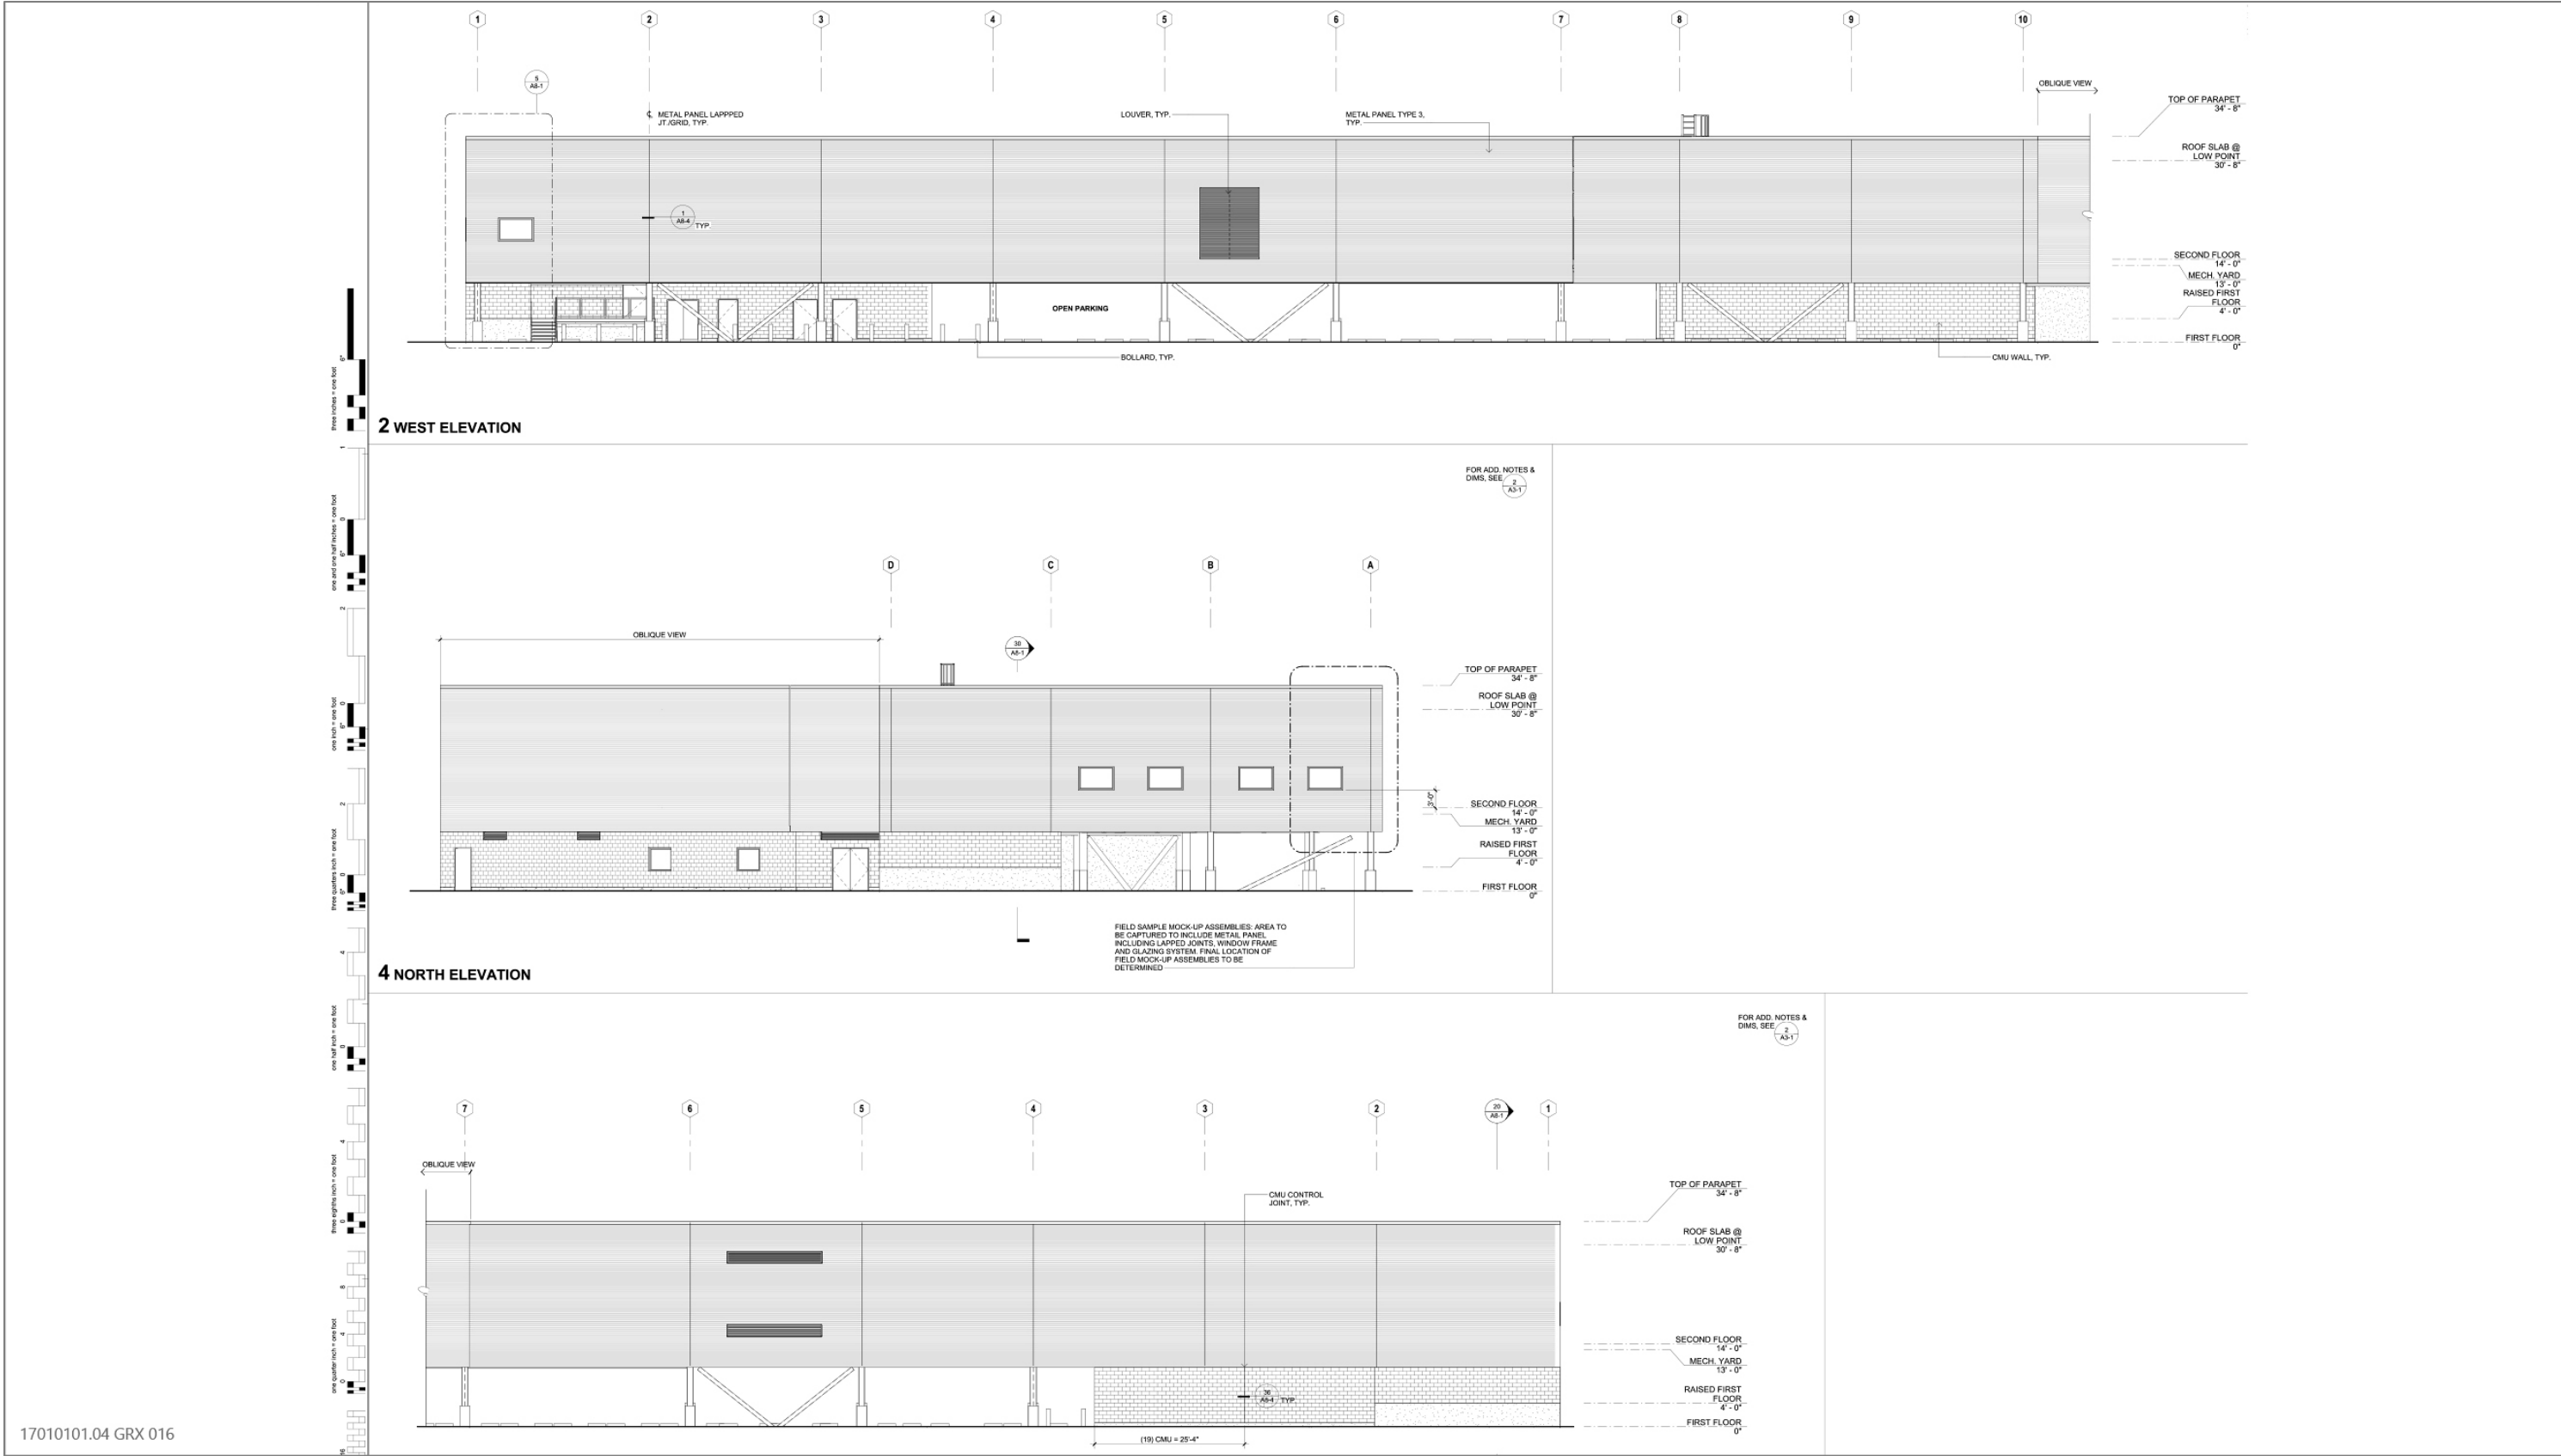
Central Plant Rendering – West, North, and East Exterior Elevations
